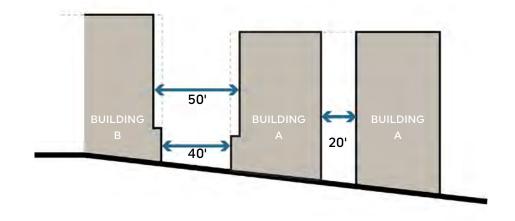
Building separation between Buildings A and B and between multiple structures in same buildable zone
